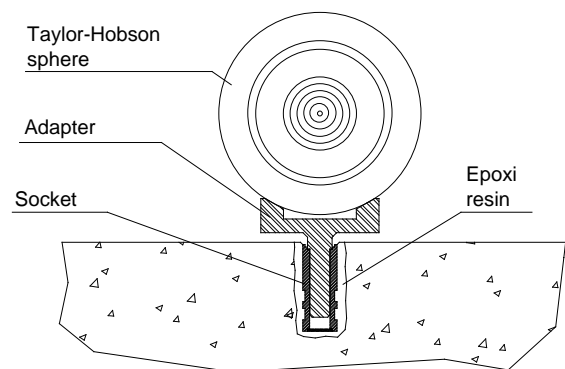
Floor reference socket holding a Taylor-Hobson sphere. When the adapter is removed, a small cap protects the socket reference surfaces.
